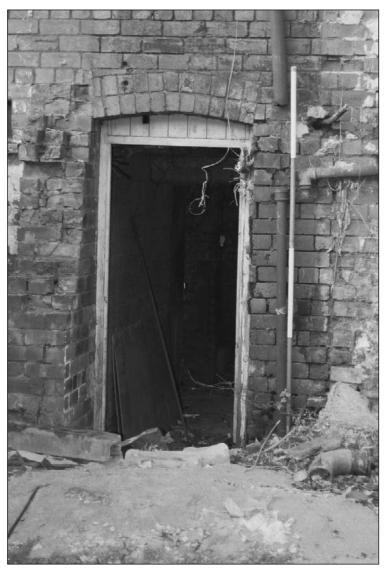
Detail of doorway leading from rear yard of Trafalgar Grinding Wheel to basement B7 of the south range, south elevation (film 46.16)
